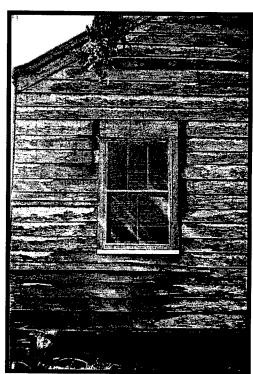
A detail of a window along the wall of the northern elevation of Standing Structure 55-1113. Note the paned (3/2) glass.
